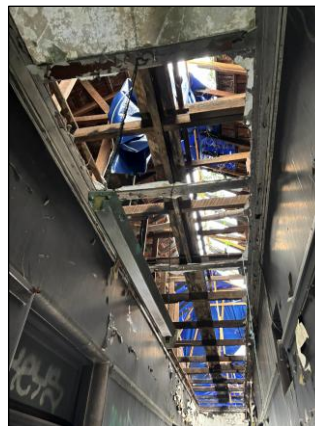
South wing fire damage viewed from an external window (Jan 26).
